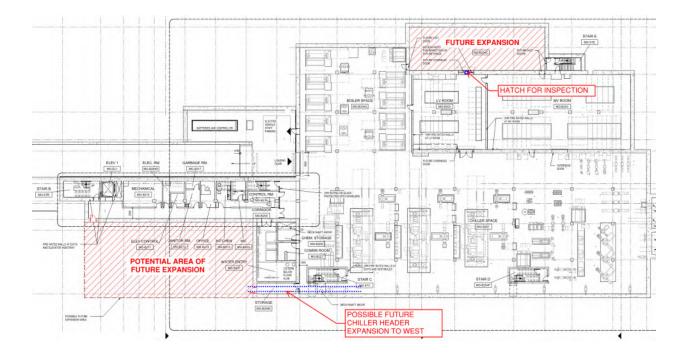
Plant Floor Plan showing potential areas for future expansion
